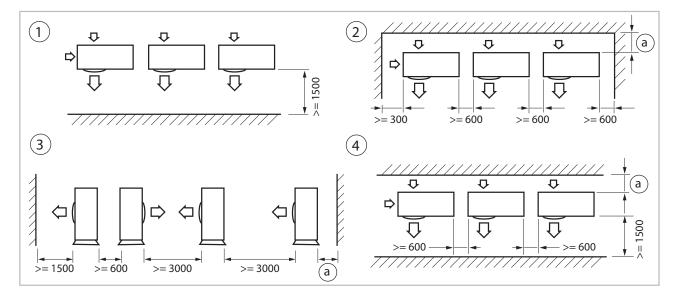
Minimum distances during construction of multiple outdoor units in mm
